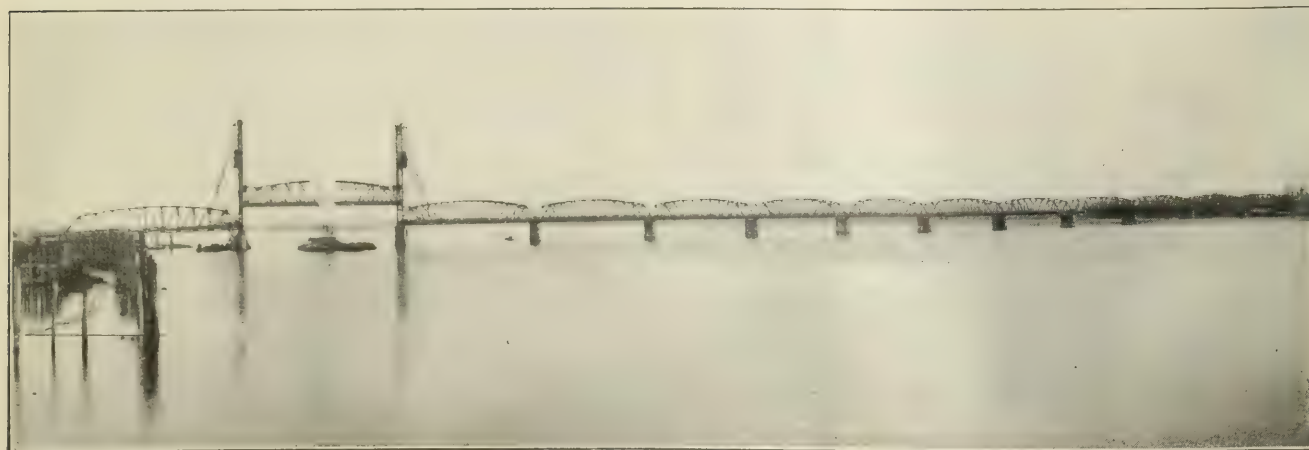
ONE SECTION OF LONG STEEL BRIDGE ACROSS COLUMBIA RIVER AT PORTLAND, ORE.
